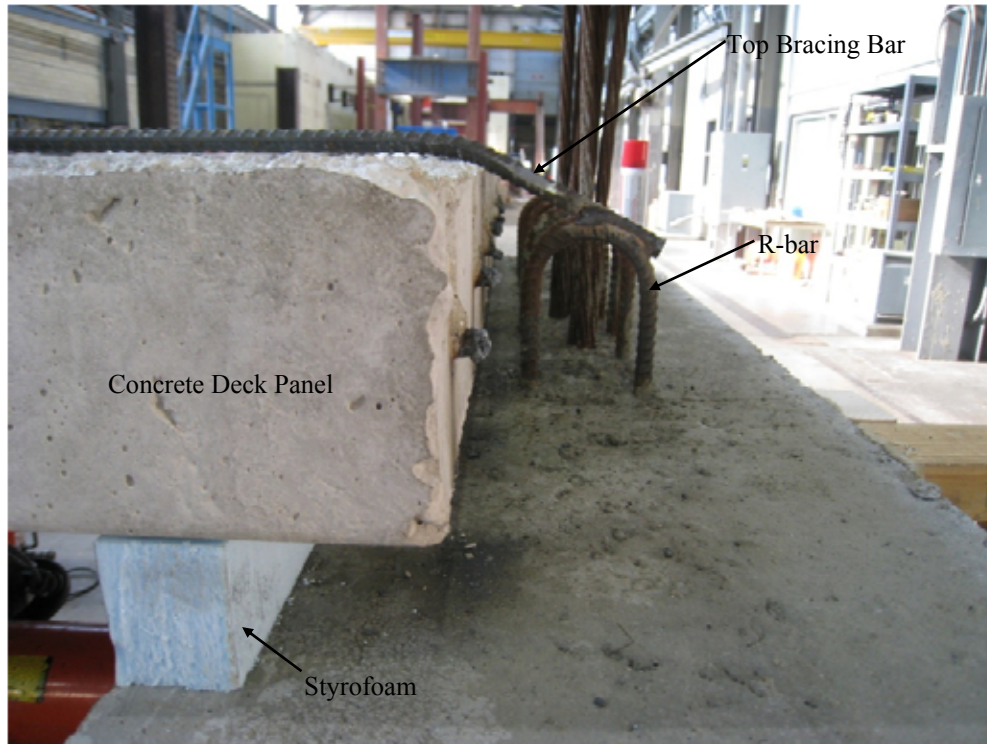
Top Bracing Bar, Concrete Deck Panel and Styrofoam in Place
